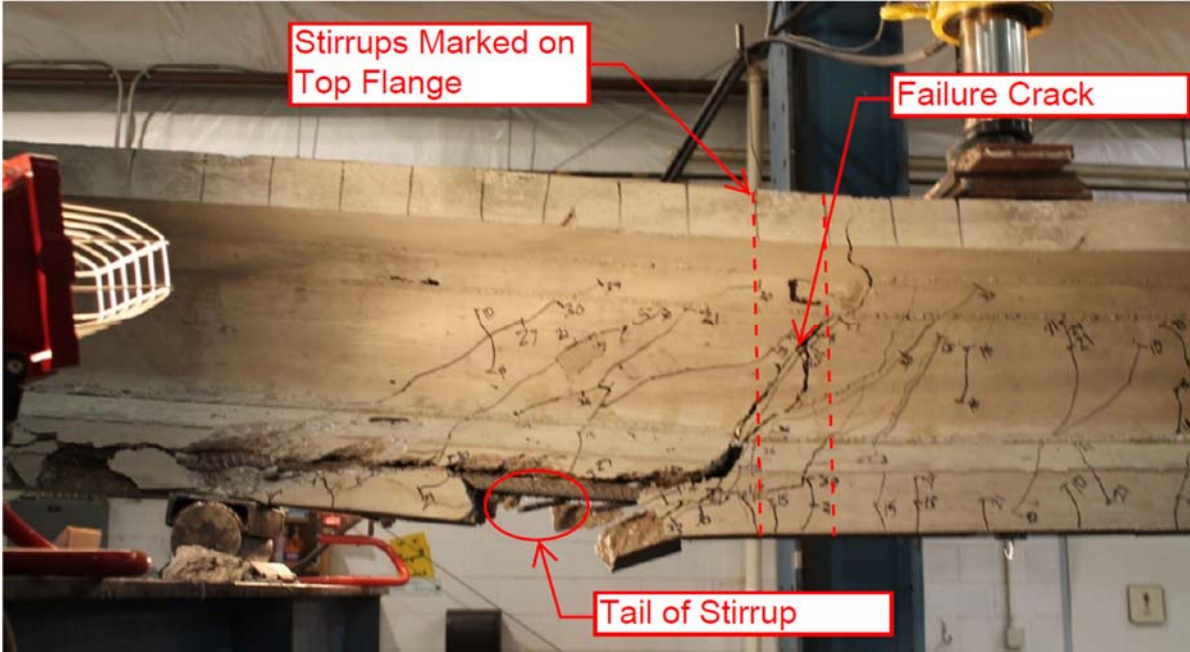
Failure of Specimen 3 Typical CFCC Reinforcement
